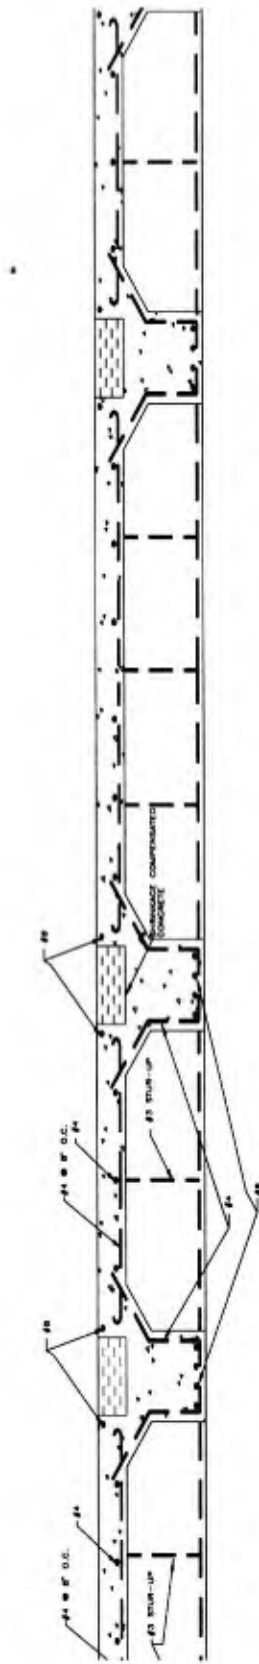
Cross section detail of main deck above rail girders after rail removal.
